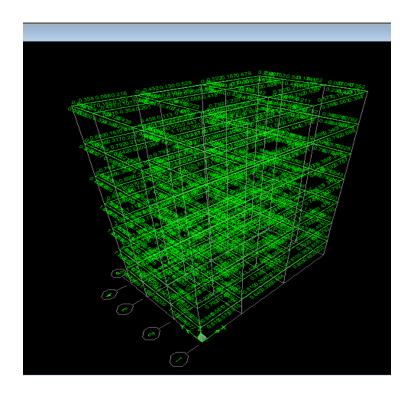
Reinforcement area of all Beams (in inch sq.)
